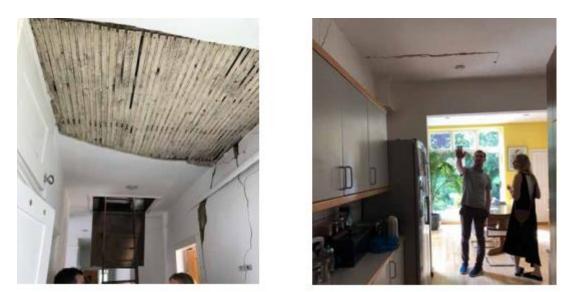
and 7 (above): Views of ceilings and walls of the property showing cracks due to subsidence
